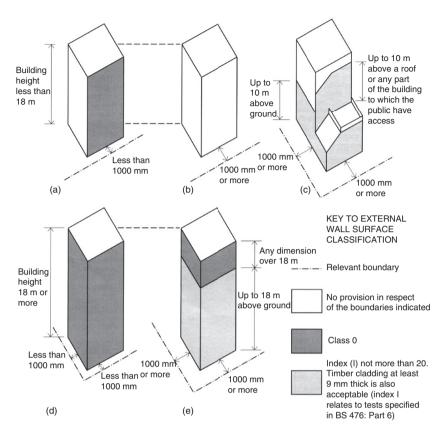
Provisions for external surfaces of walls. (a), (d), (e) Any building. (b) Any building other than (c). (c) Assembly or recreation building of more than one storey
